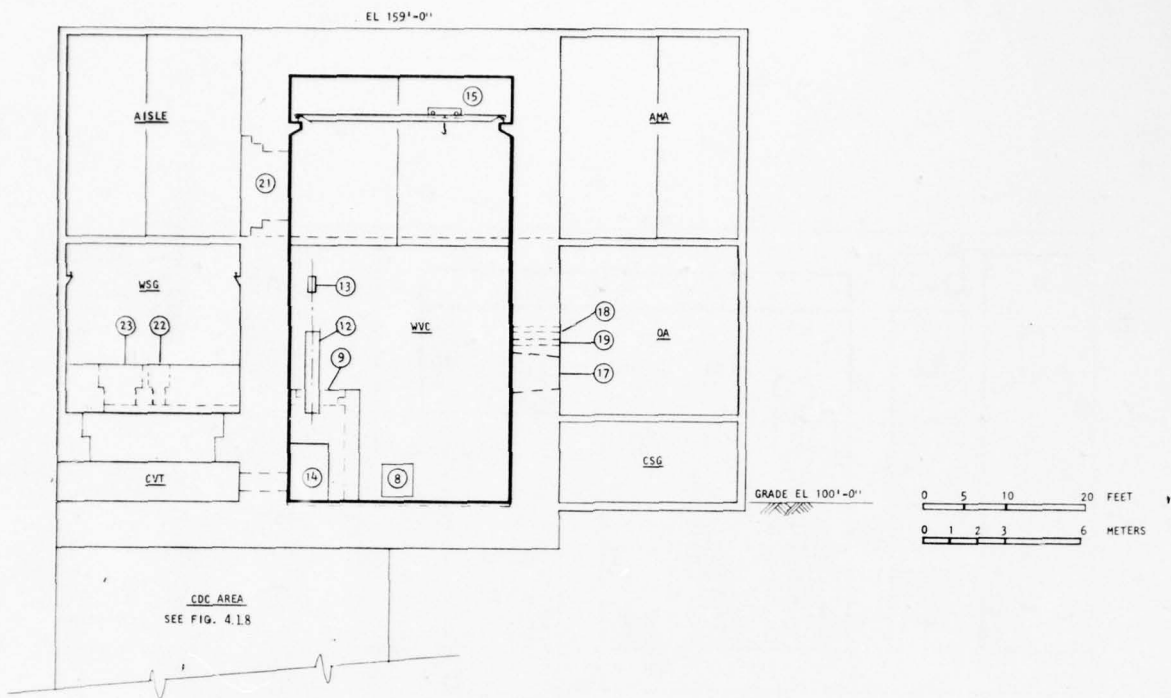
Waste Vitrification Process Equipment Arrangement, Section C-C
